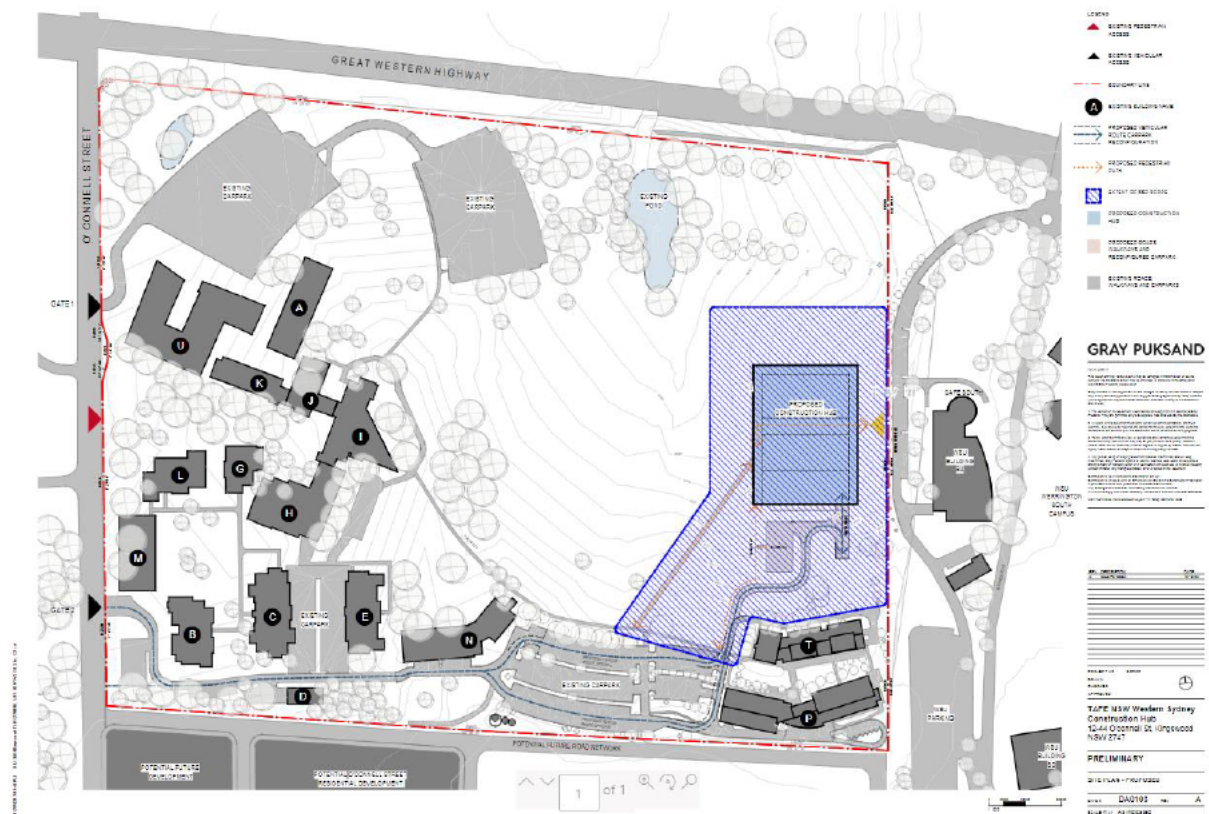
Proposed site plan showing location of works (blue hatching) in the eastern portion of the site.
